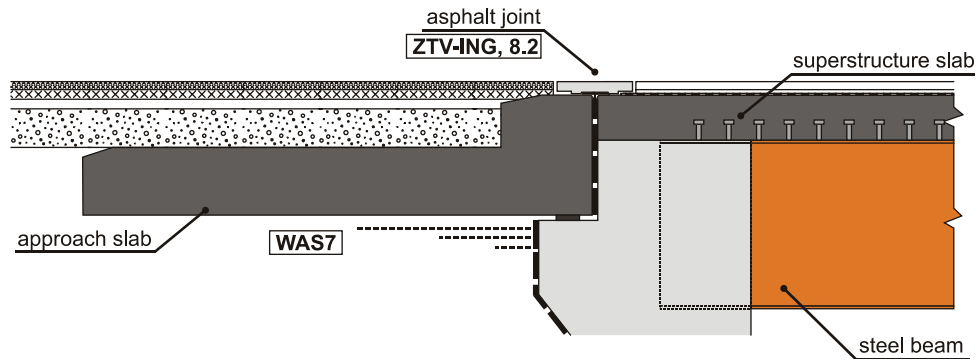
approach slab with asphalt joint acc. to (ZTV-ING, 2003), ZTV-ING 8.2
